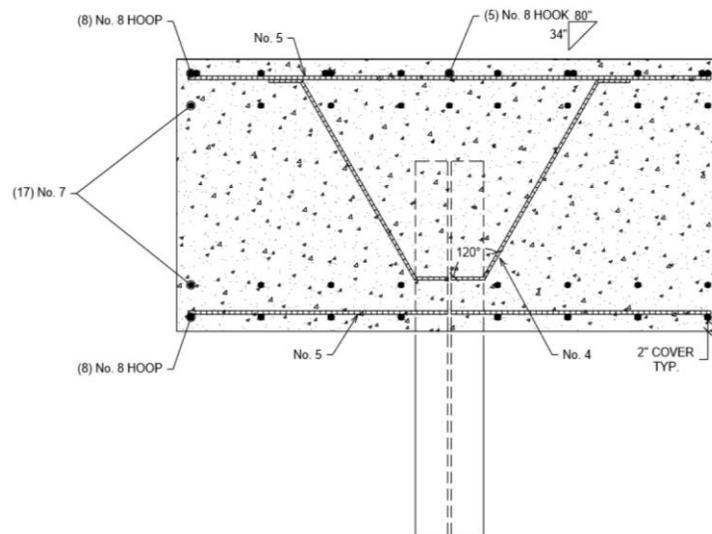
35 Plan View of UHPC-Joint specimen [67].
